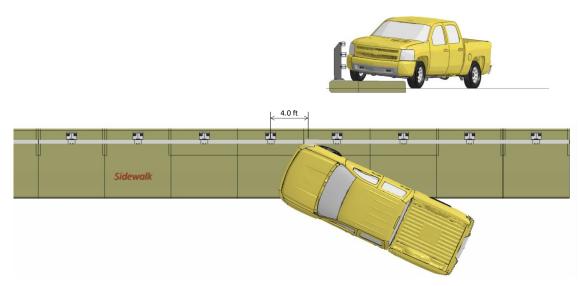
Impact point with bridge rail for Test 4-11 on the sidewalk-mounted S3-TL4.
